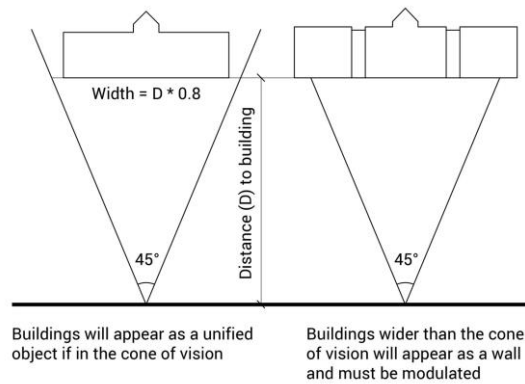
(3.1). Buildings facing the viewer for which the width is less than 0.8 times the distance to the viewer will fit within the 45 degree cone of vision and appear as individual elements. Those buildings that are outside the cone of vision appear more like a wall. Therefore, such wider facades should be modulated per WCC 10.36.050(3).
